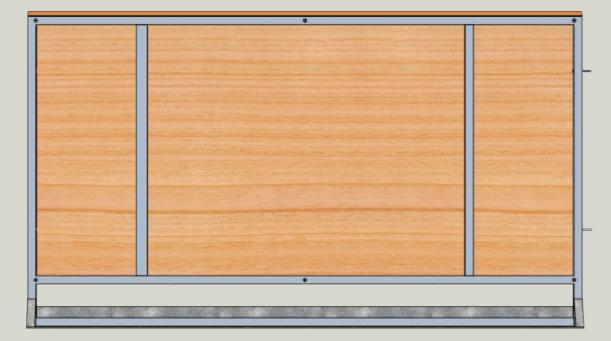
Detail of handrail of concept 3 with sponsor ridge.
